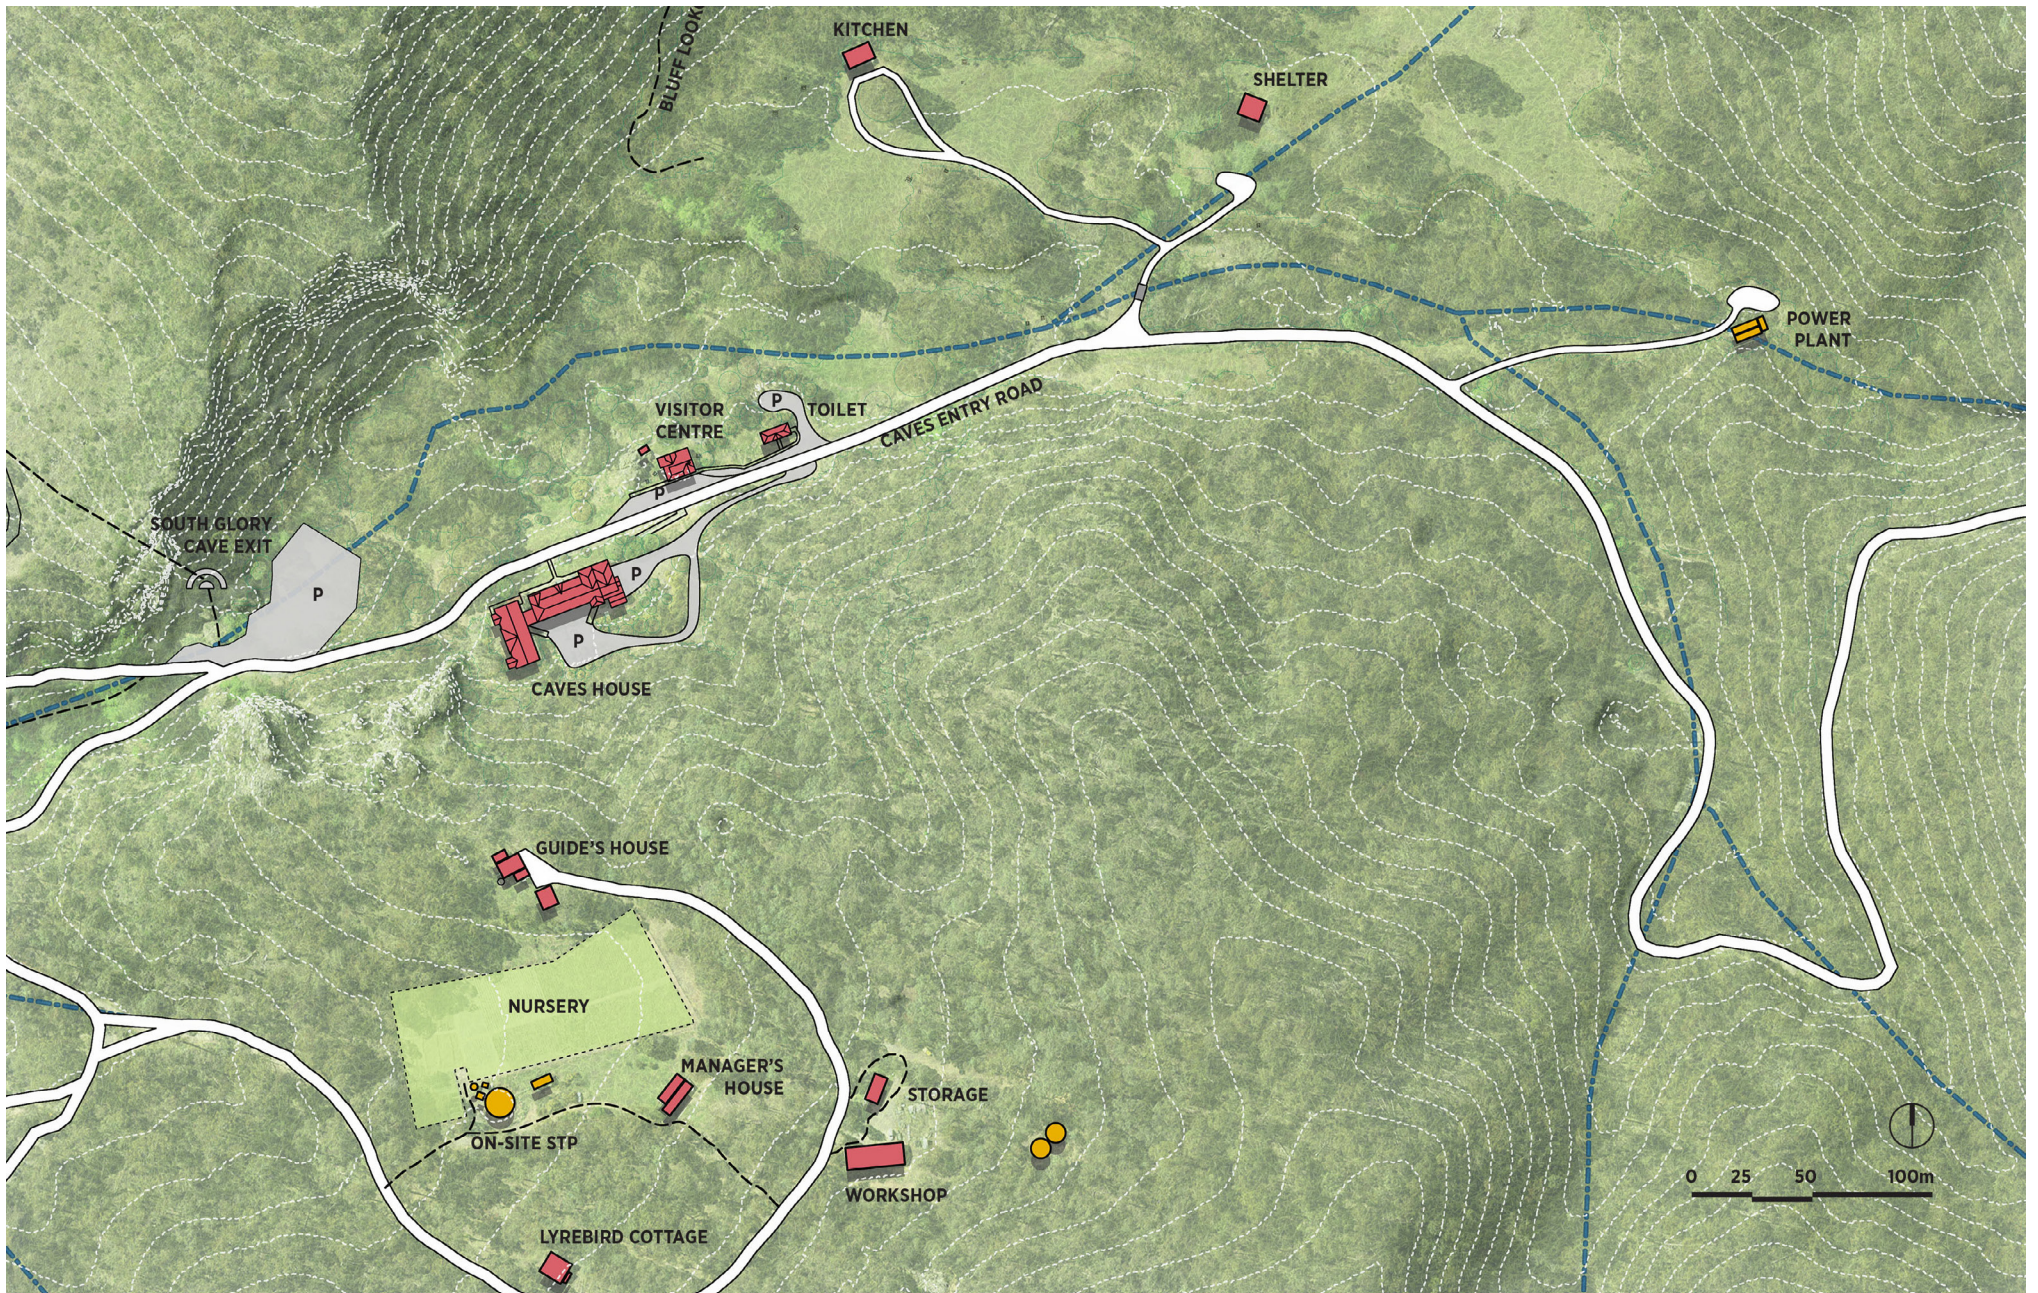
Yarrangobilly Caves Existing Detail Site Plan (JPW)
